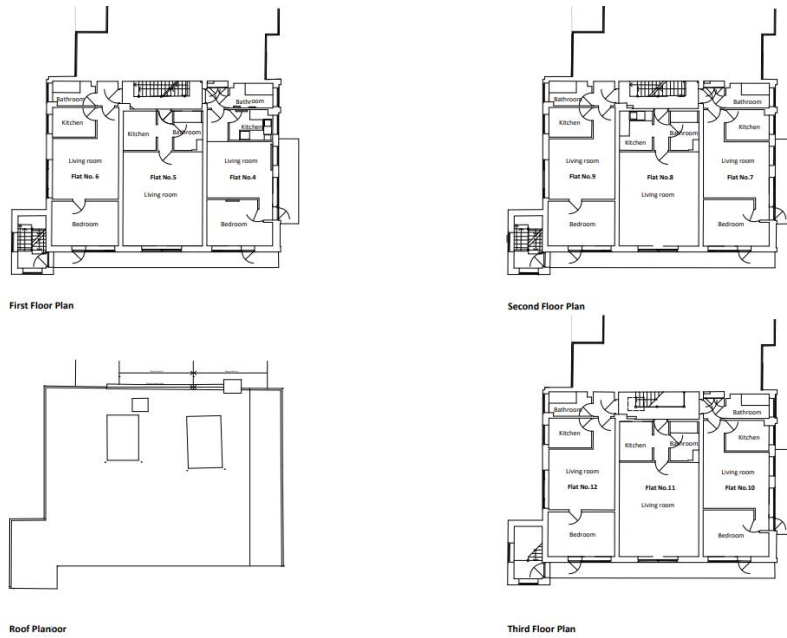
Floor Plans No. 35 Twickenham Road 19/1390/FUL
